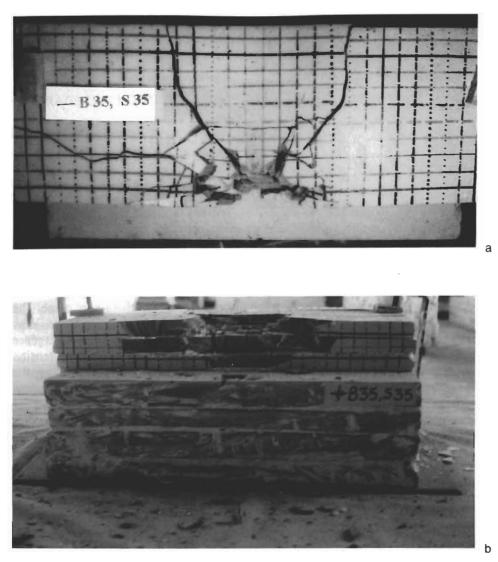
Blasted block with horizontal joints. a) Top view of reassembled fragments for horizontal joints (showing fracture pattern and b) Front view of reassembled fragments for horizontal joints.
